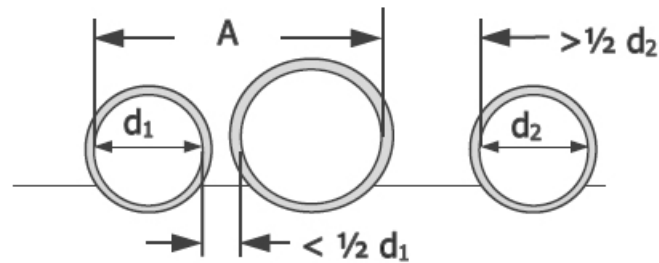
Profile View of a Multi-Pipe Culvert Under Fill
